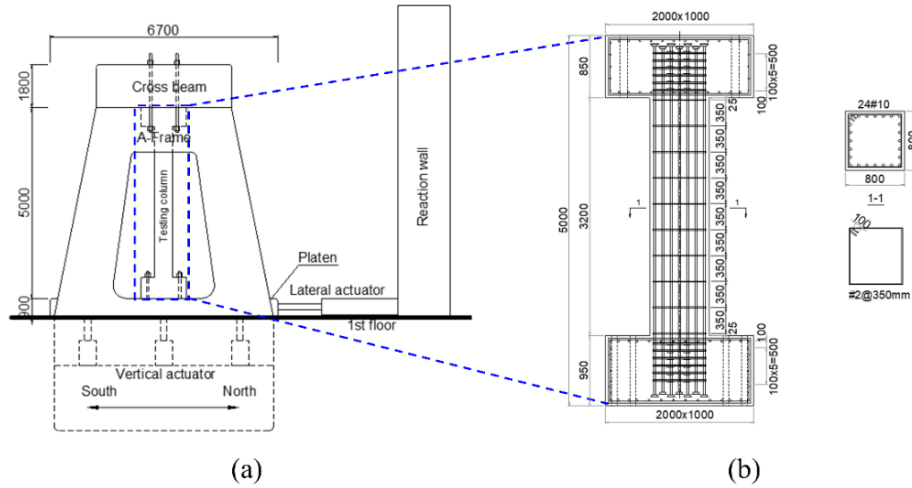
Full-scale shear-critical RC column test (Huy et al. 2022; Yuen et al. 2022): (a) test set-up; (b) rebar details (dimensions in mm).
